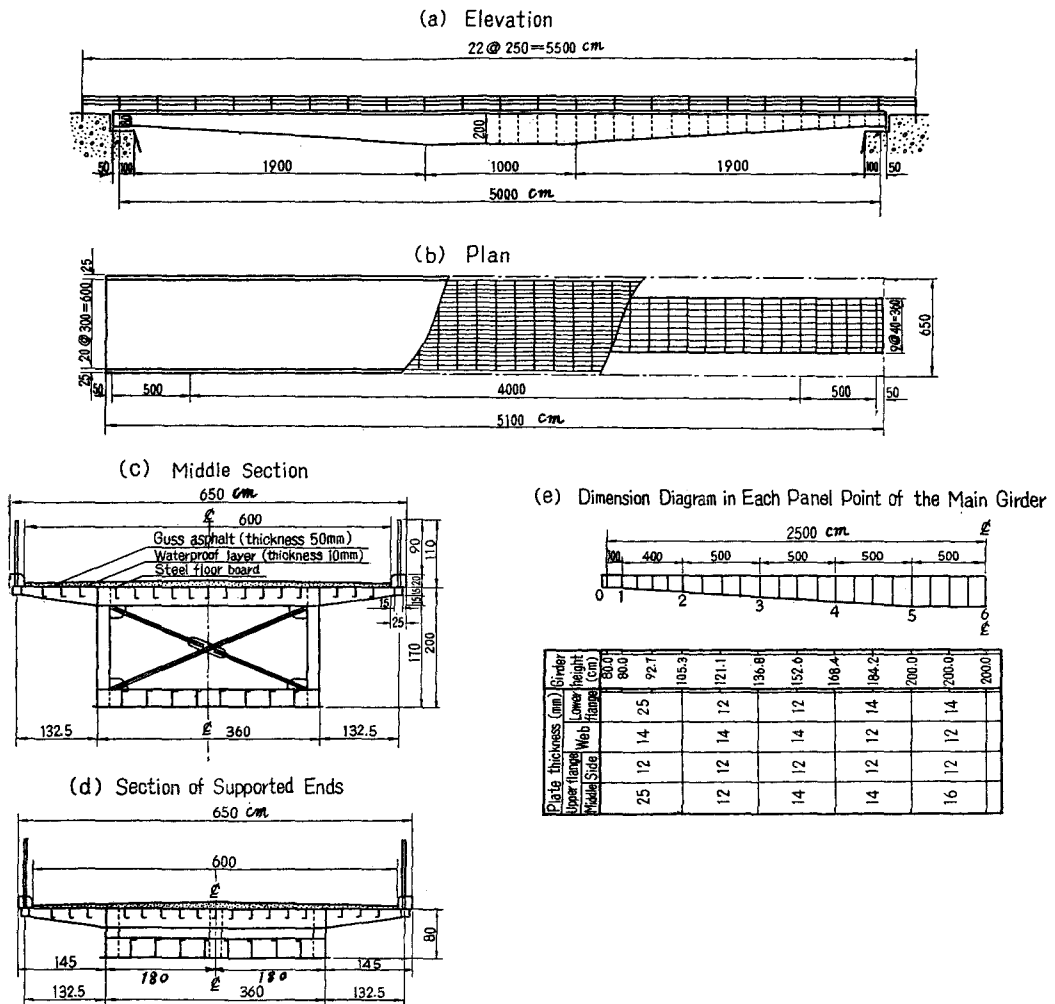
Out line Plan of a Box Girder Bridge with Varying Sections and Steel Floor Plates.
